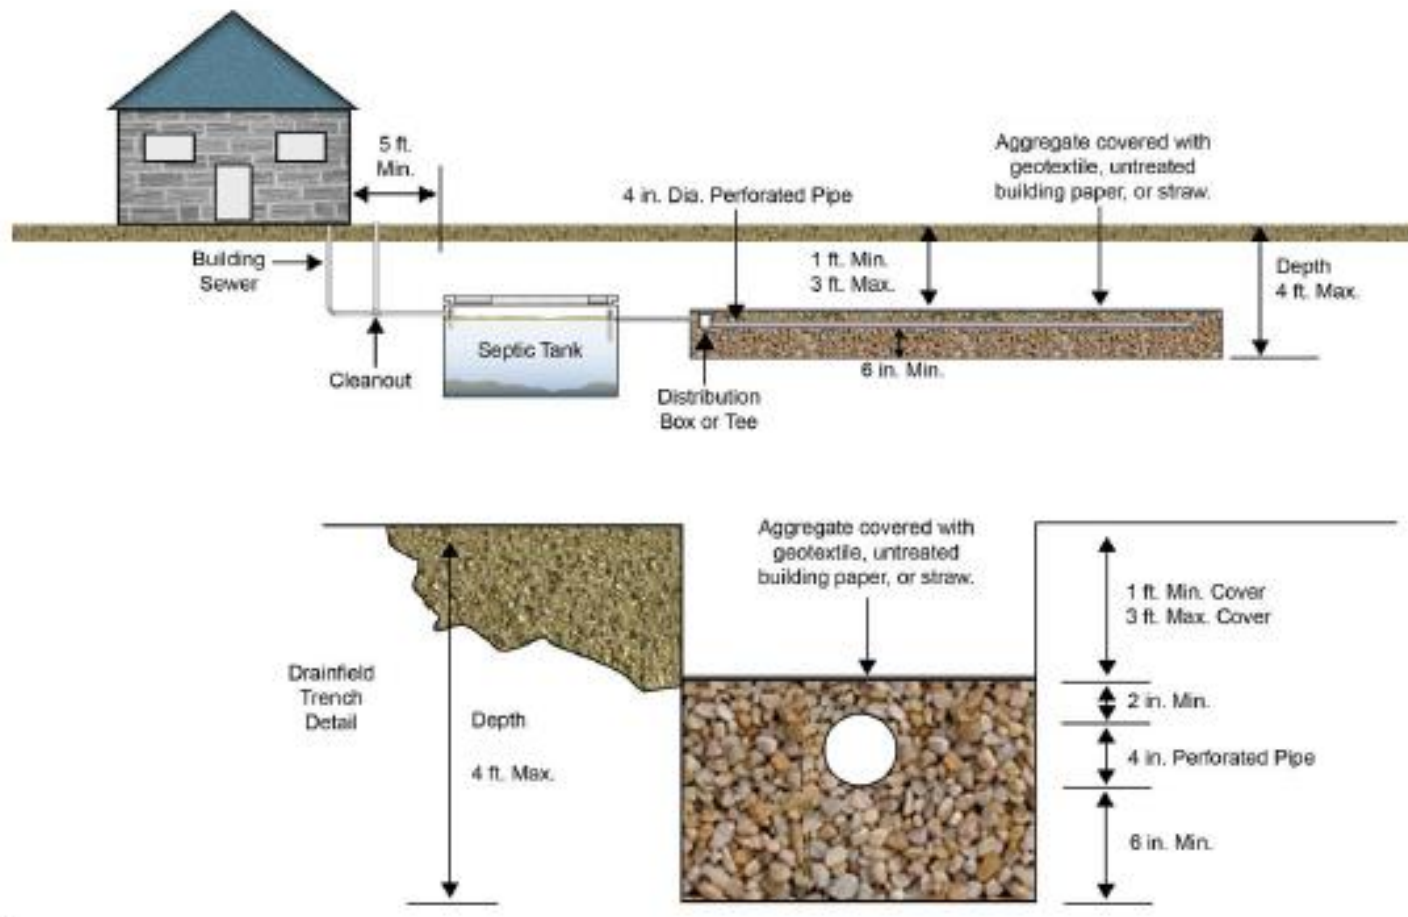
Cross-sectional view of a standard drainfield and trench dimensional installation requirements.
